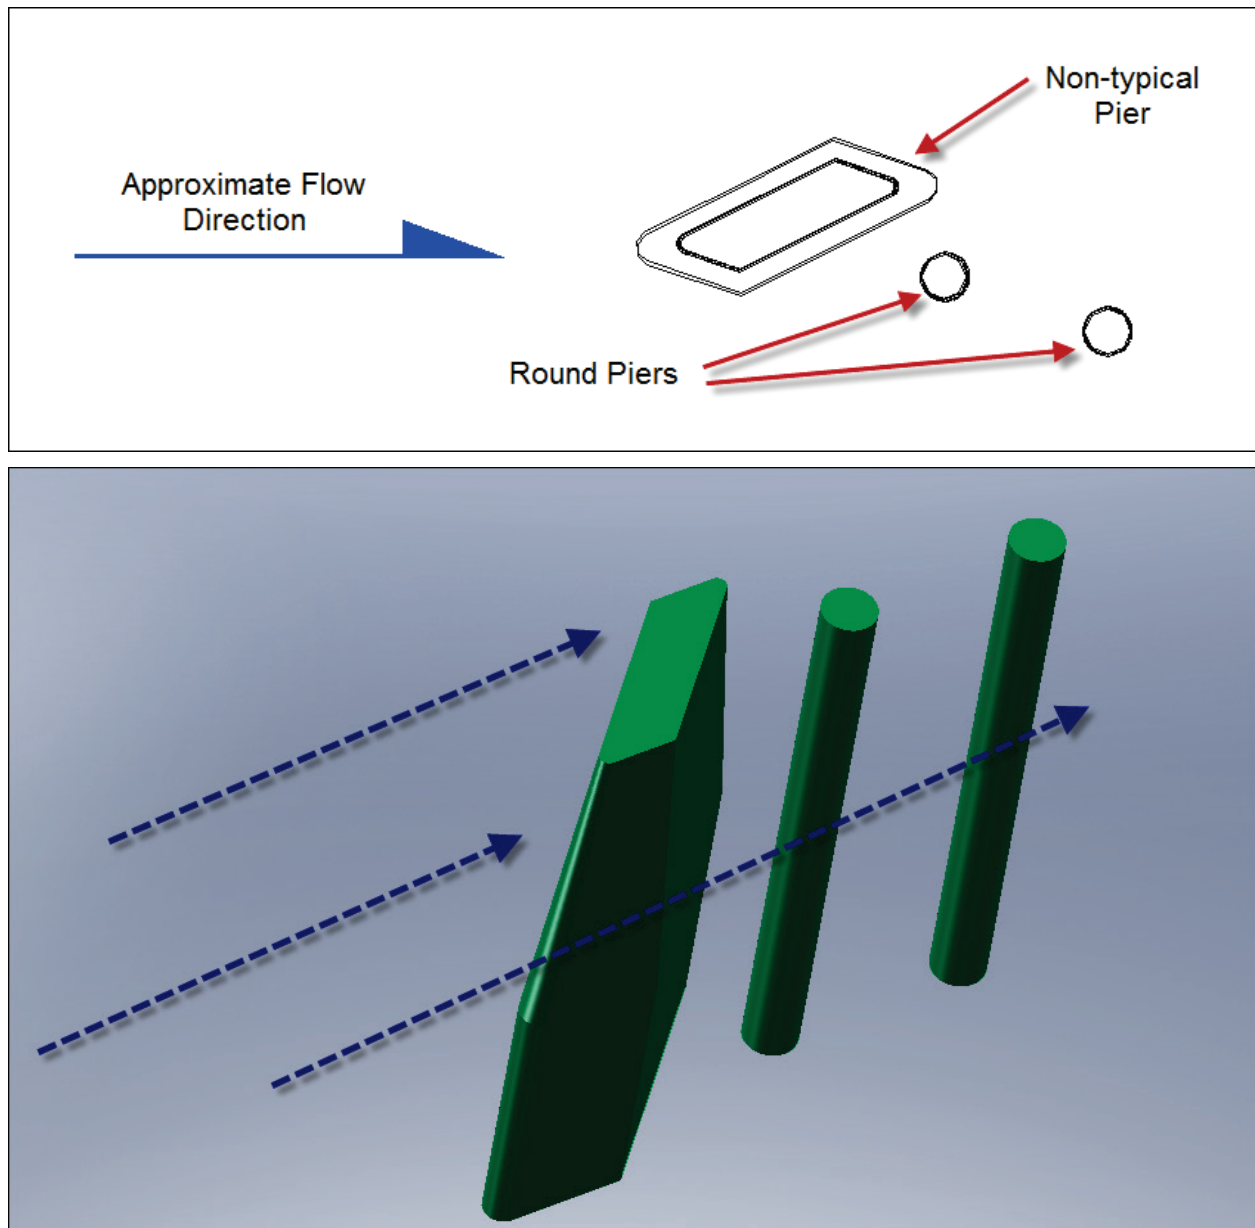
Typical configuration of pier sets at the BNSF railroad bridge, plan view above and three-dimensional (3D) rendering below.
